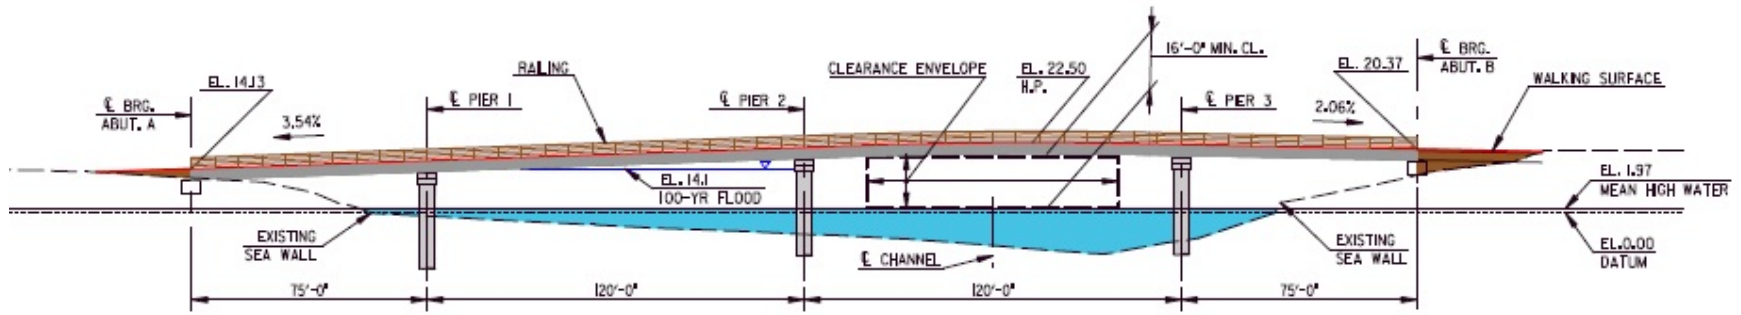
GIRDER BRIDGE DESIGN EXAMPLE
